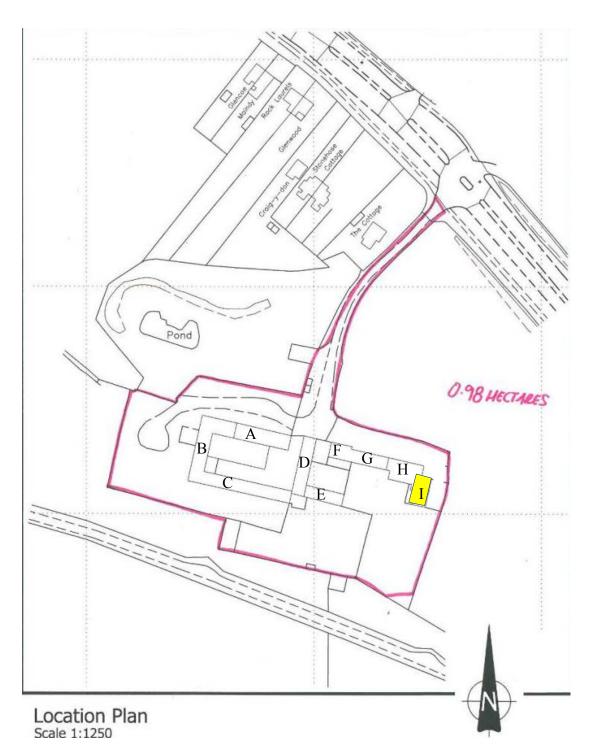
Site plan Supplied by client. Building identification letters used in this report shown. House (I) shown in yellow
